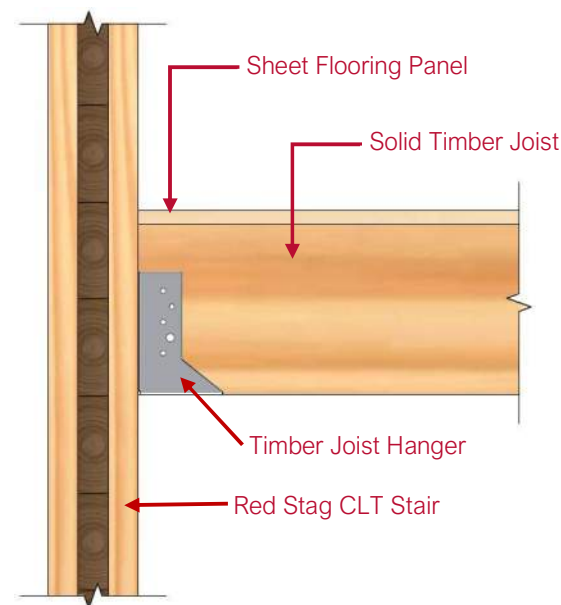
Solid timber joist to Red Stag CLT wall panel connection detail.
